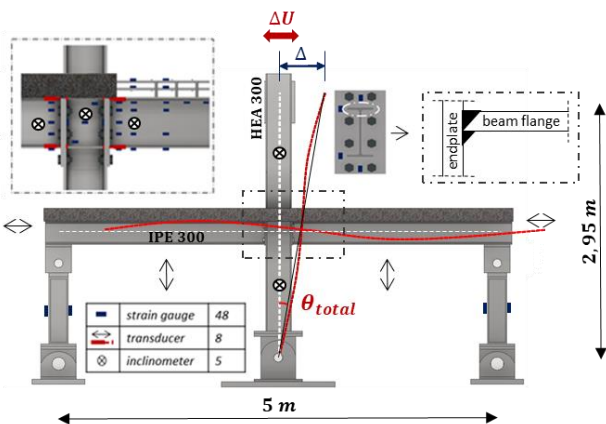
Measurement equipment, boundary conditions and type of beam-to-endplate welds.
